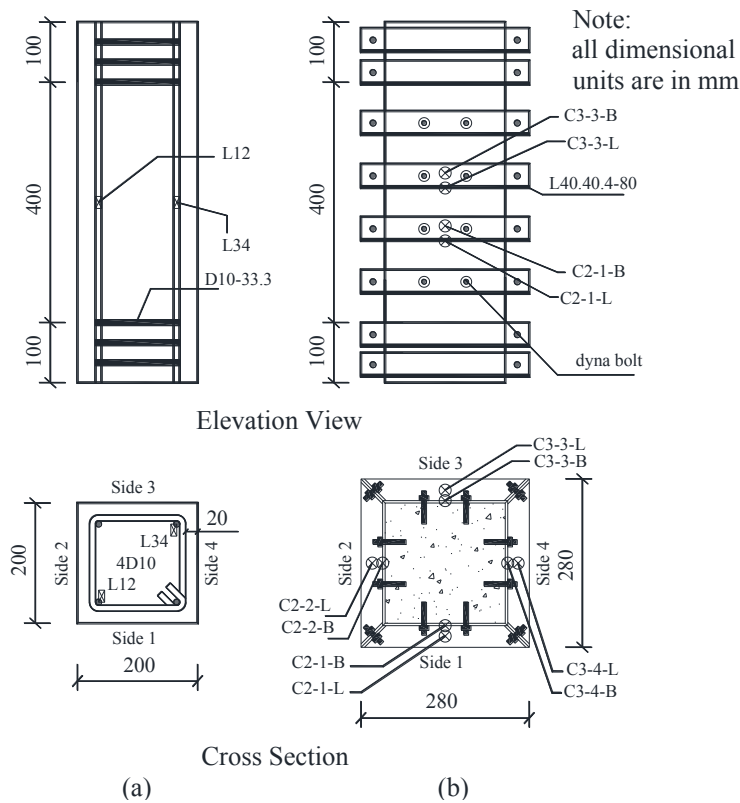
Elevation view and cross section of Specimen S04d : (a) reinforcement details ; and (b) external steel collars
